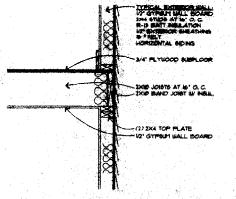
DETAIL: IST FLOOR AT BEAM 6CALE: 1' . 1'-0'
